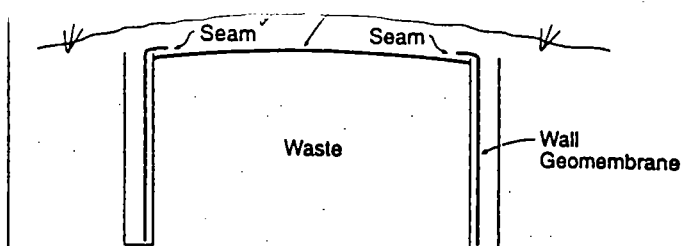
b. Horizontal or vertical overlap of a geomembrane in the cover.
